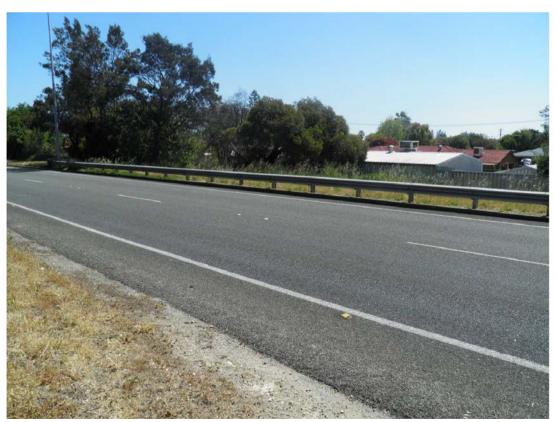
Approach 2 right hand side barrier (Taken: 02-Nov-2016)
